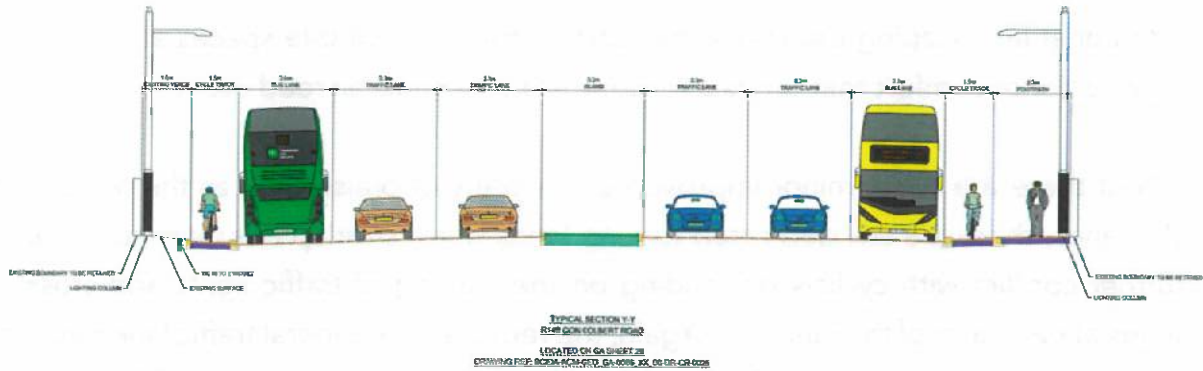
Cross section Y-Y: Excessive 3.3m lanes proposed beside narrow 1.5m cycle lane on Con Colbert Road
